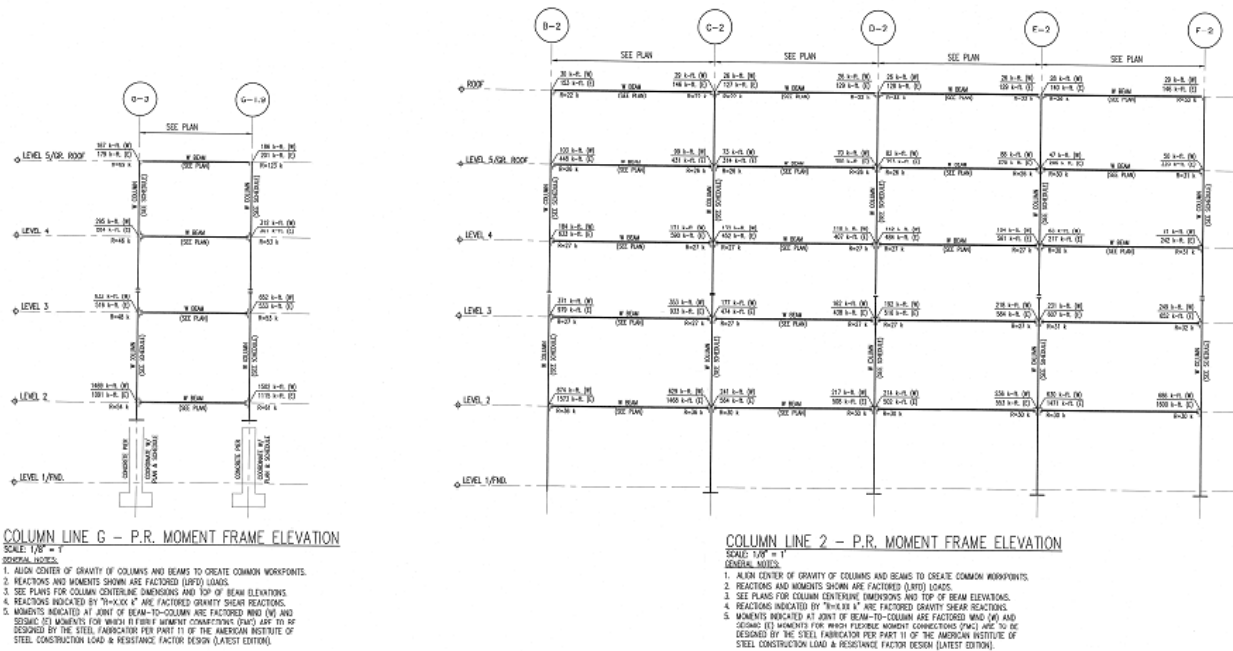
P.R. Moment Frame Elevations (G and 2)
